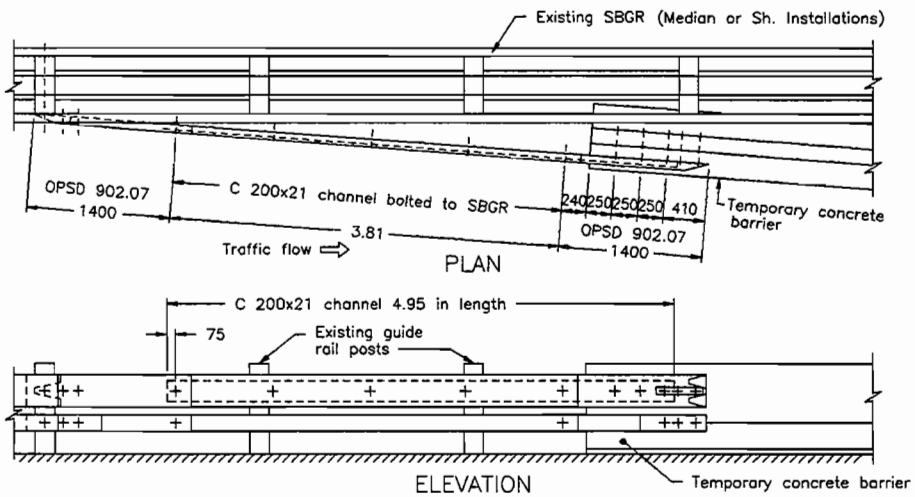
Temporary Connection to Steel Beam Guide Rail
